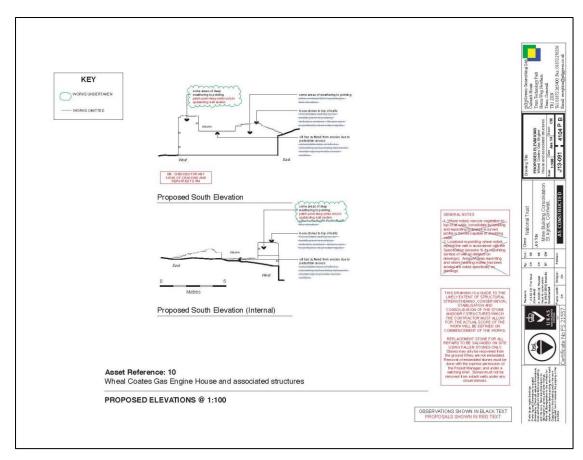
External and internal elevations of Wheal Coates gas engine house.
